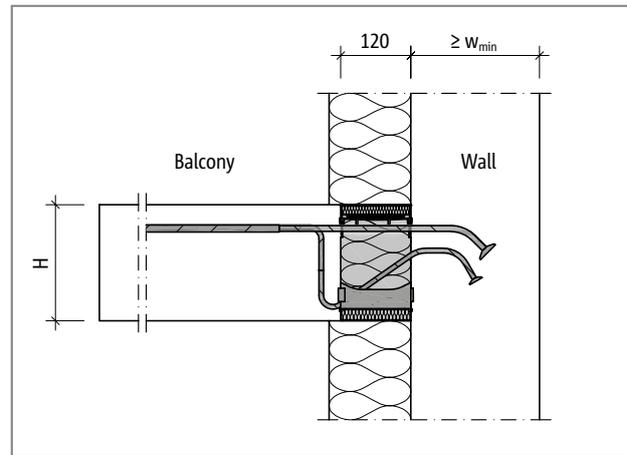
Schöck Isokorb® XT type K-O: Wall connection downwards with external insulation
